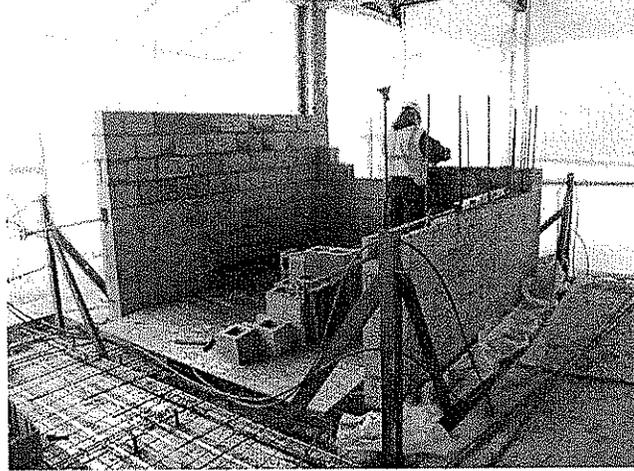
View northwest of the elevator shaft on the 3rd floor of segment E. February 18, 2011.
